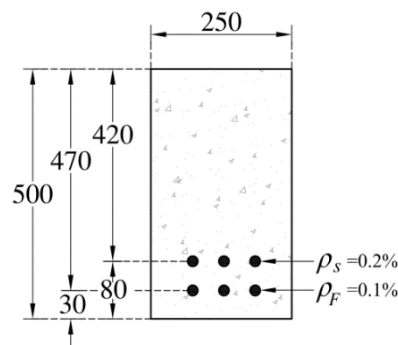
Geometry and reinforcing scheme of the cross-section considered in the model appraisal (dimensions in mm)
